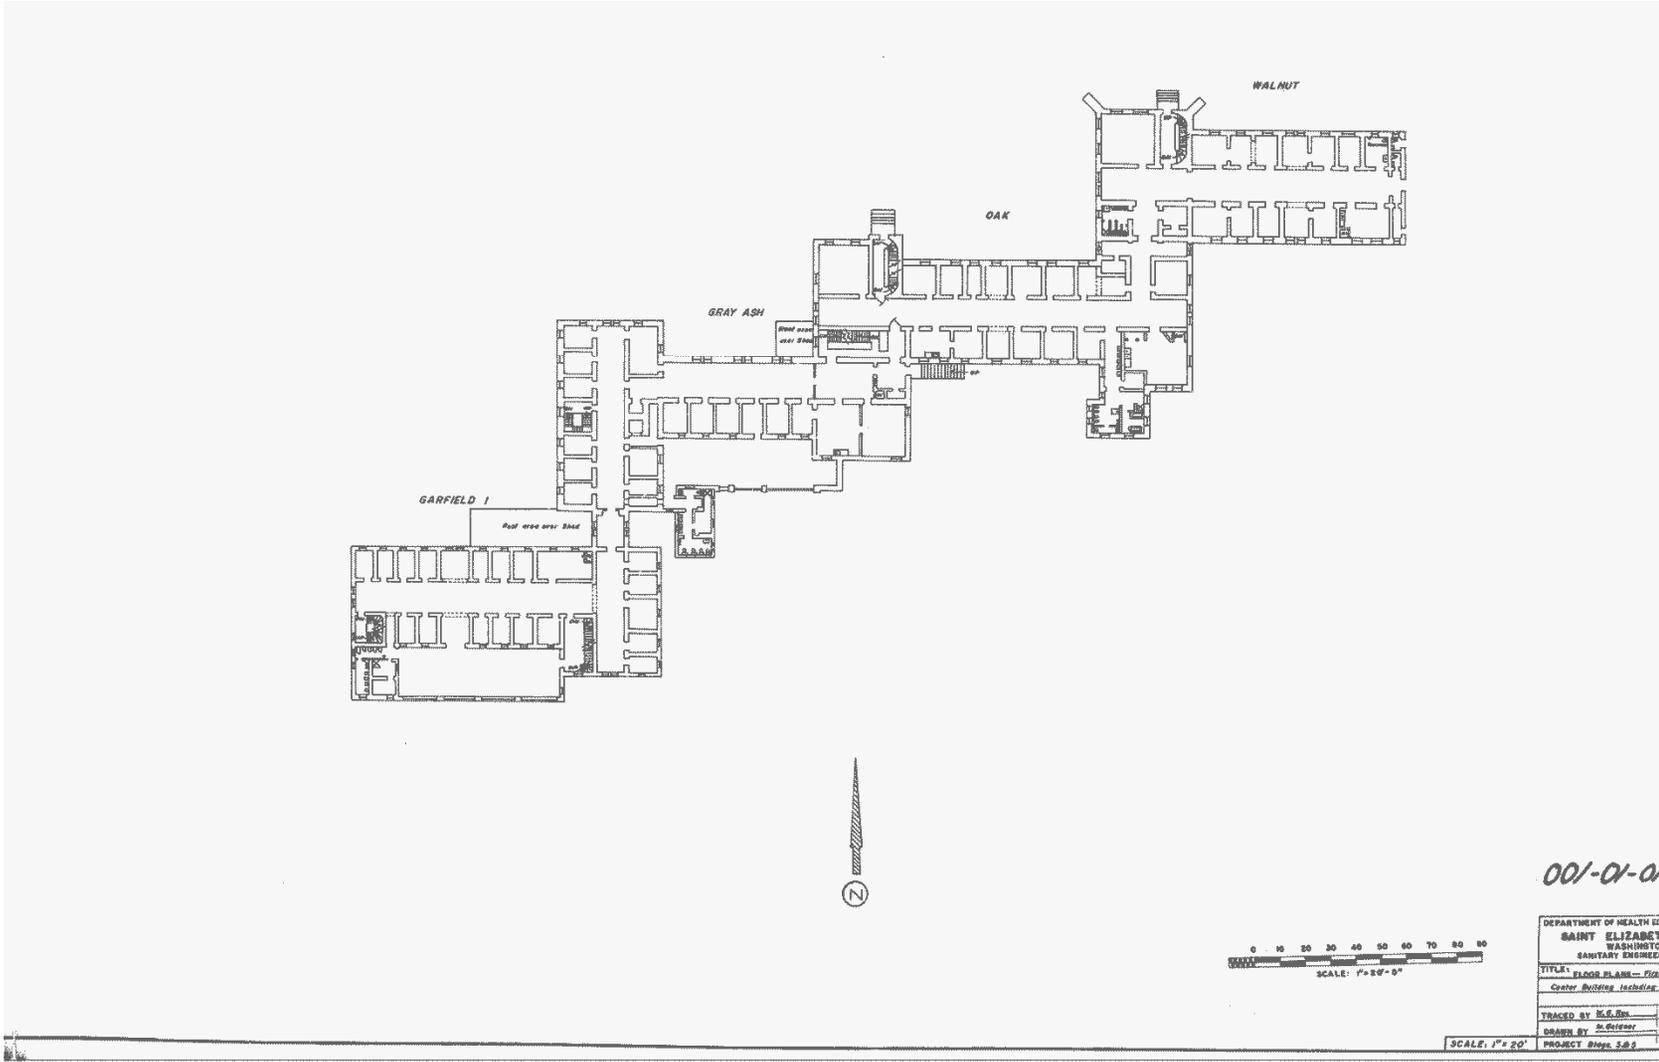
First floor plan of West Wing and Garfield Building, 1966. Source GSA archives, image DC0070SE0102.
